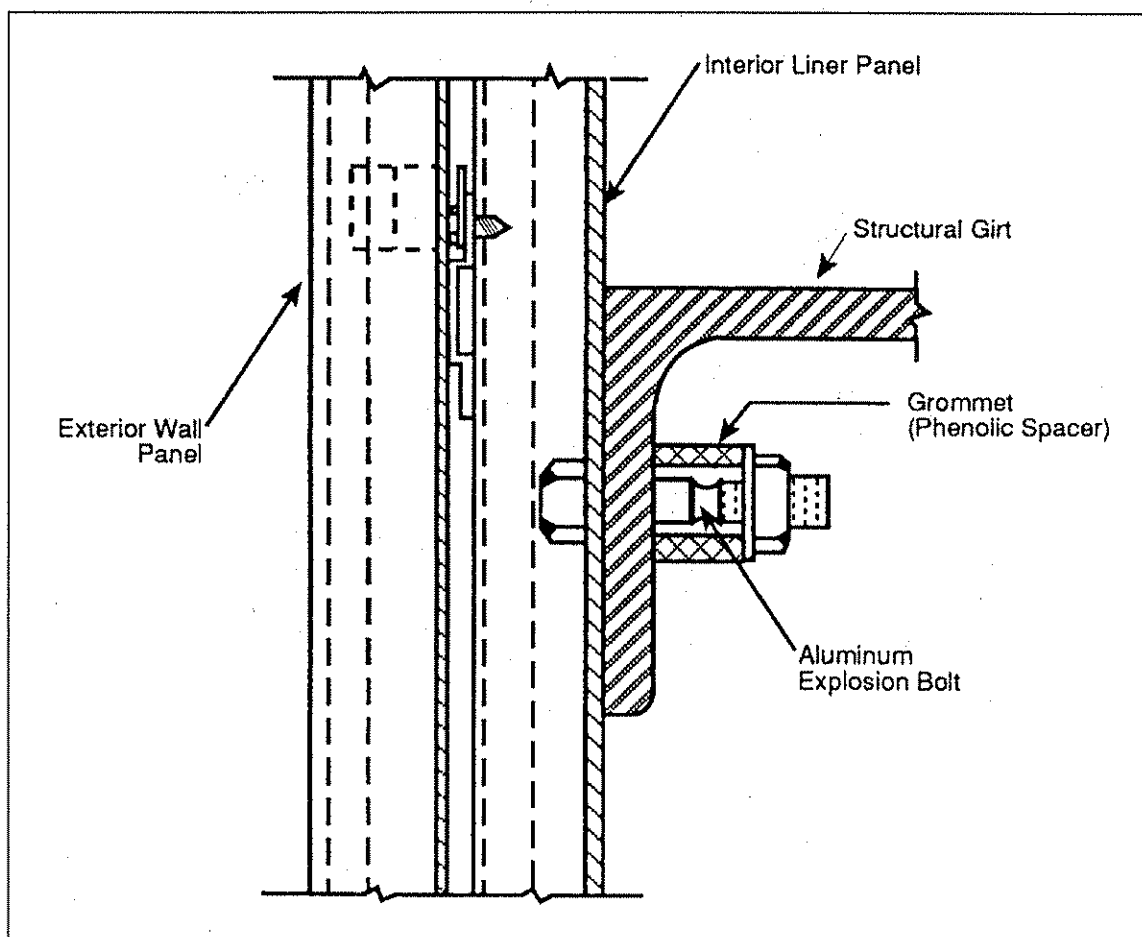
Reduced-shank machine bolt installed to fail in tension.
